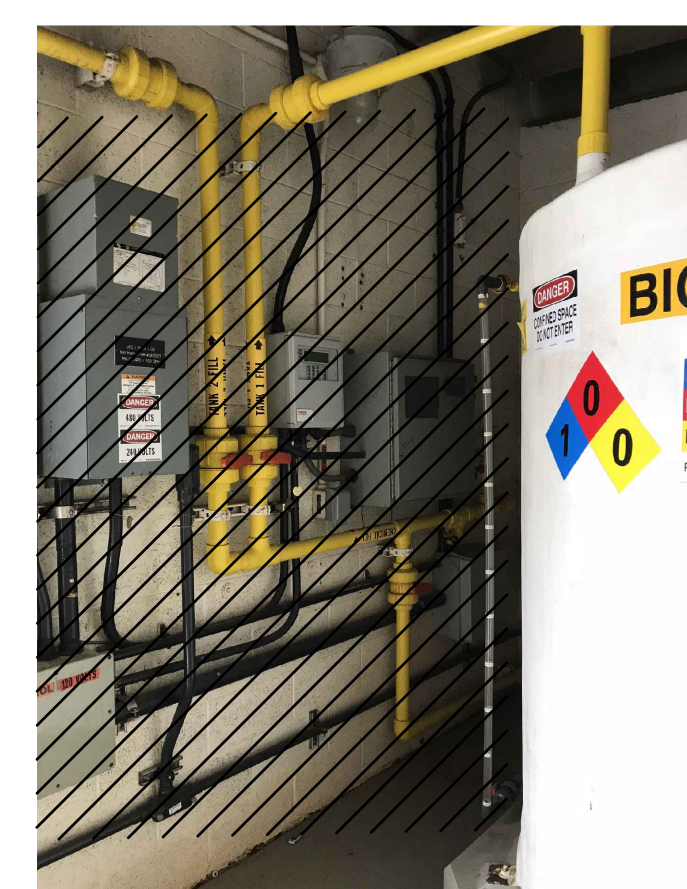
CHEMICAL BUILDING DEMO DETAILS
